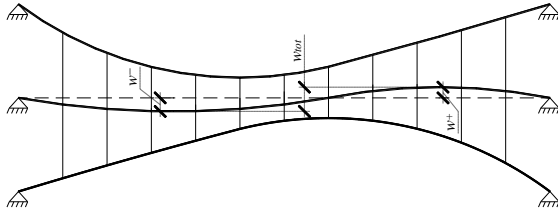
Deformed shape of prestressed suspension bridge in non-symmetrical loading case
